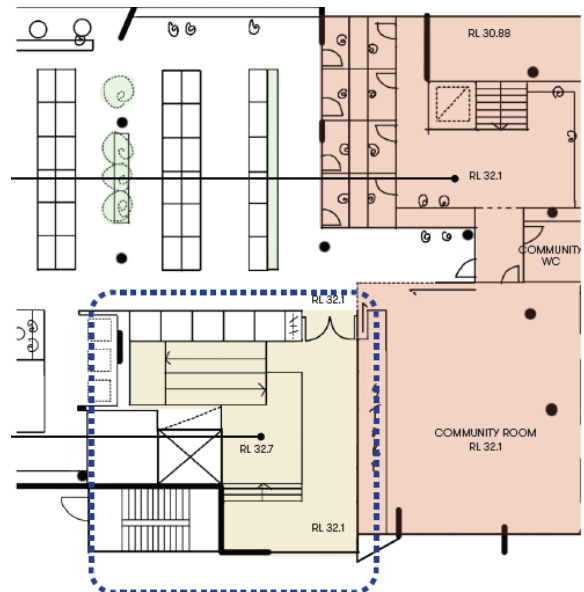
Accessible pathways to bike storage in basement (outlined in blue)
